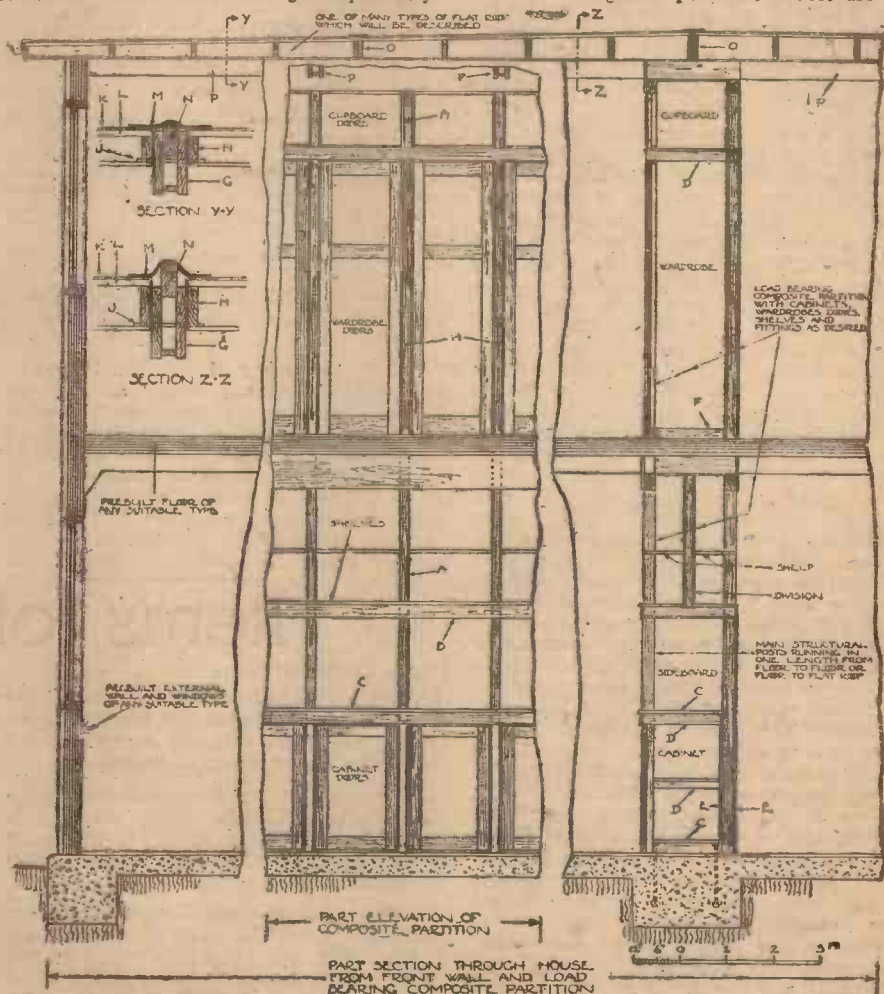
COMPOSITE PARTITIONS AND FLAT ROOF. A—Structural posts. B—Rails. C—Shelf. D—Bearer. E—Linings. F—Sill. G—Composite beam. H—Side of panelled unit. J—Metal corbet extending through beam to form bearer for panelled units. K—Roofing material. L—Boarding. M—Joint cover. N—Packing laid to falls. O—Joists at junction between units. P—Part section and elevation of composite beam.
